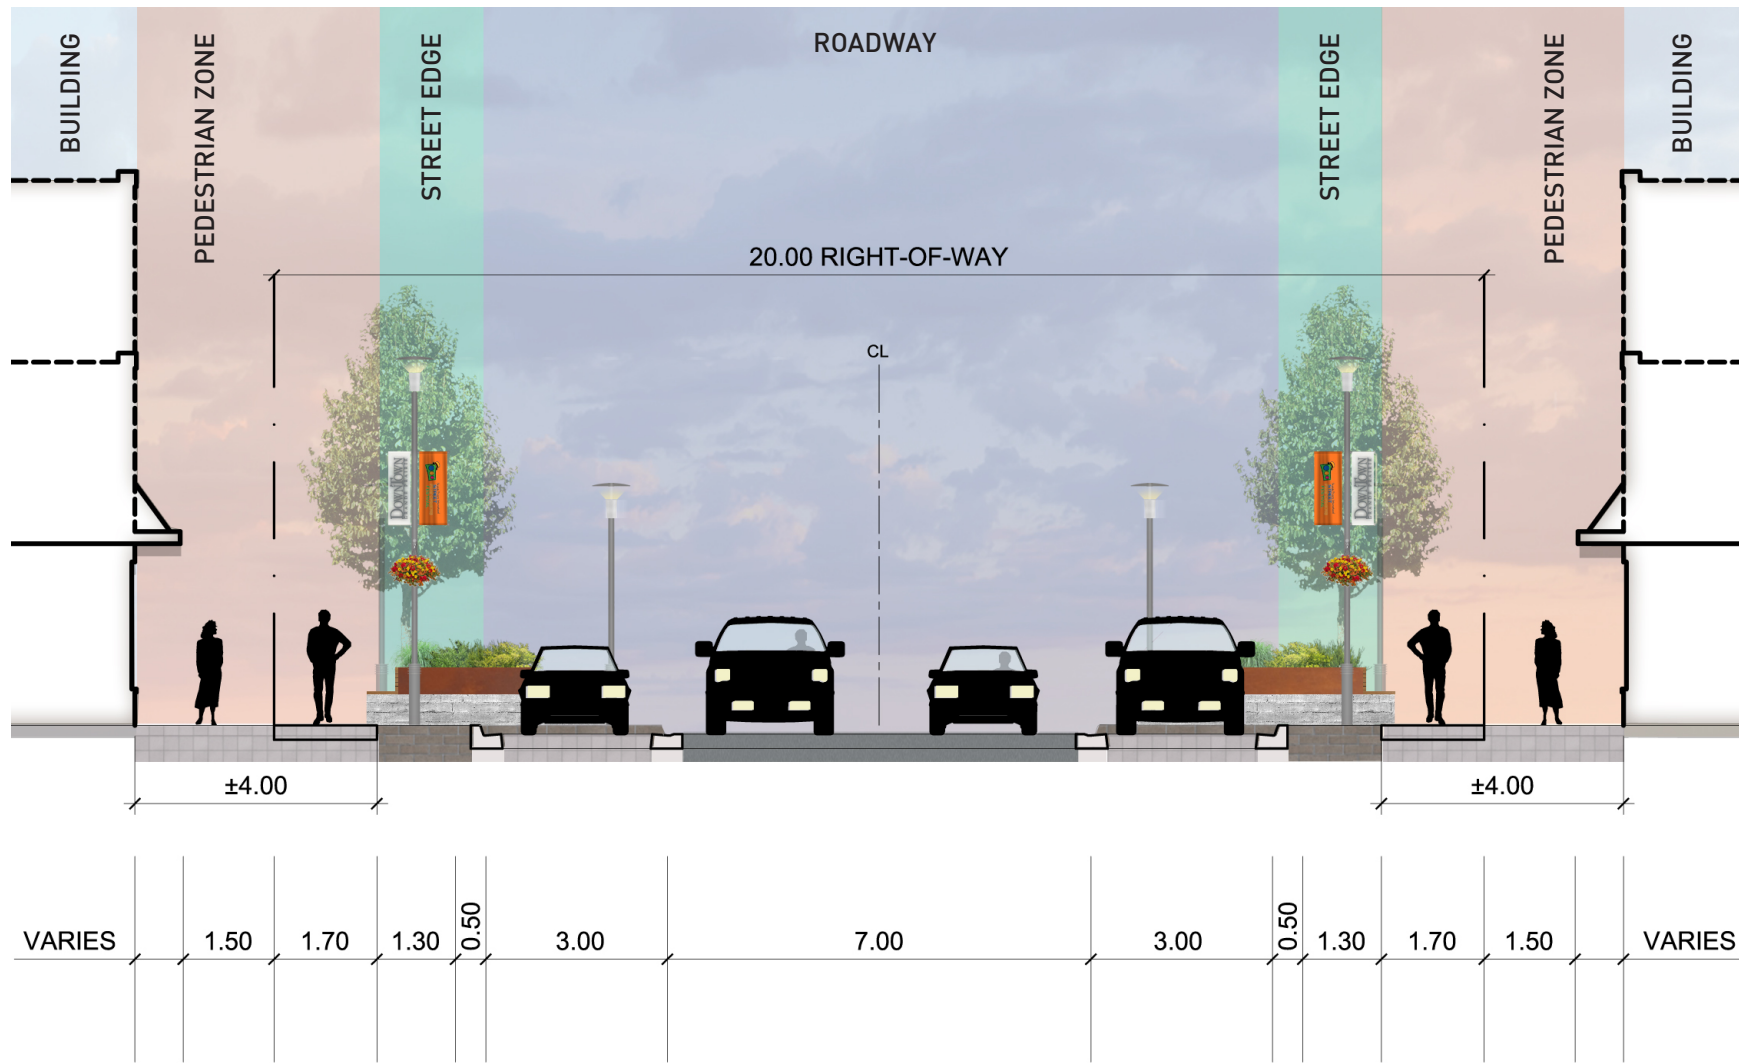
100th Avenue Urban Streetscape ROW Cross Section
